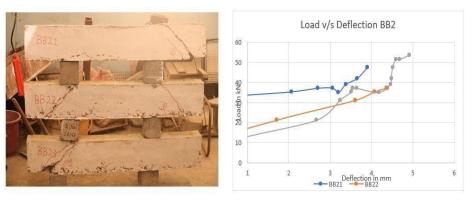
Crack pattern as well as Basalt reinforced beam load-deflection graph
